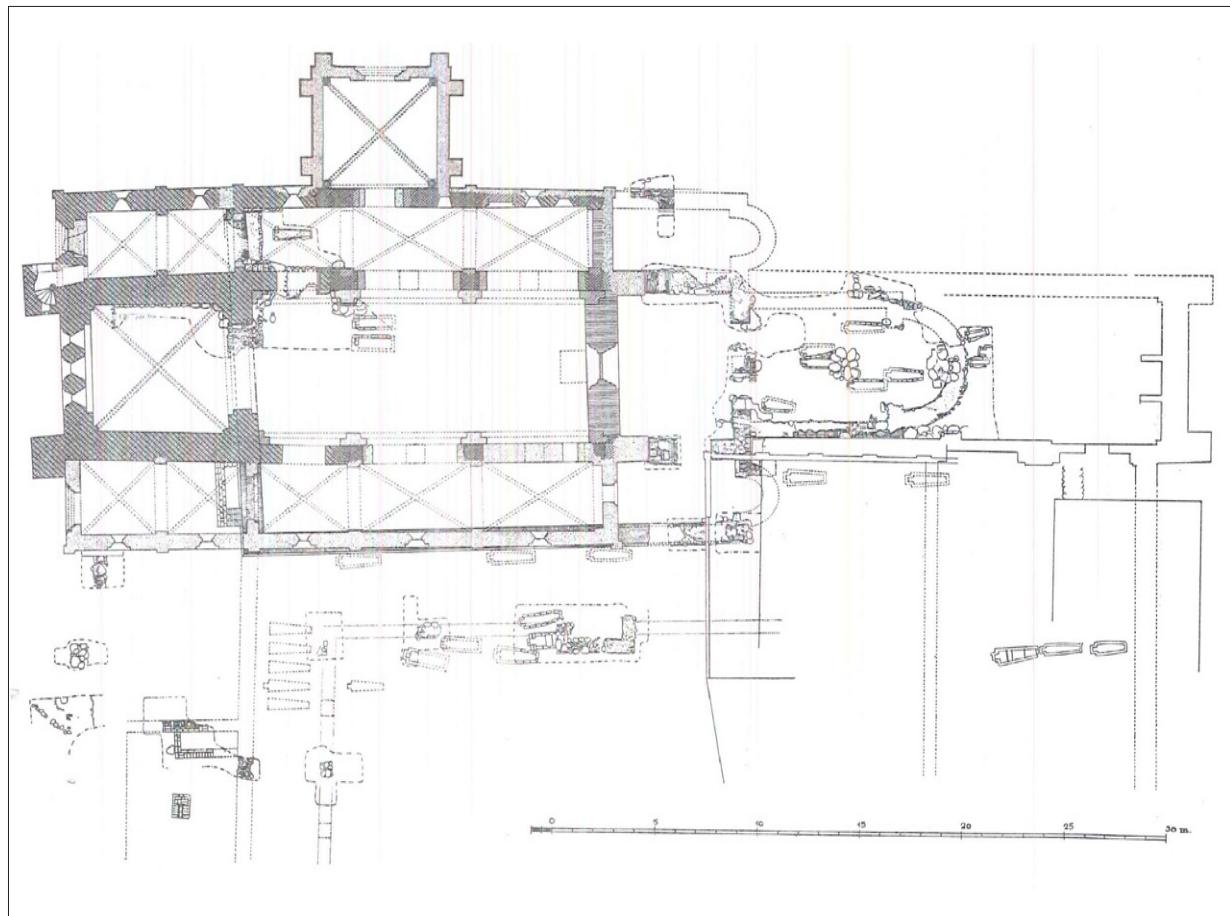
Church of Our Lady in Roskilde. Excavation plan from 1935. After Danmarks Kirker.
